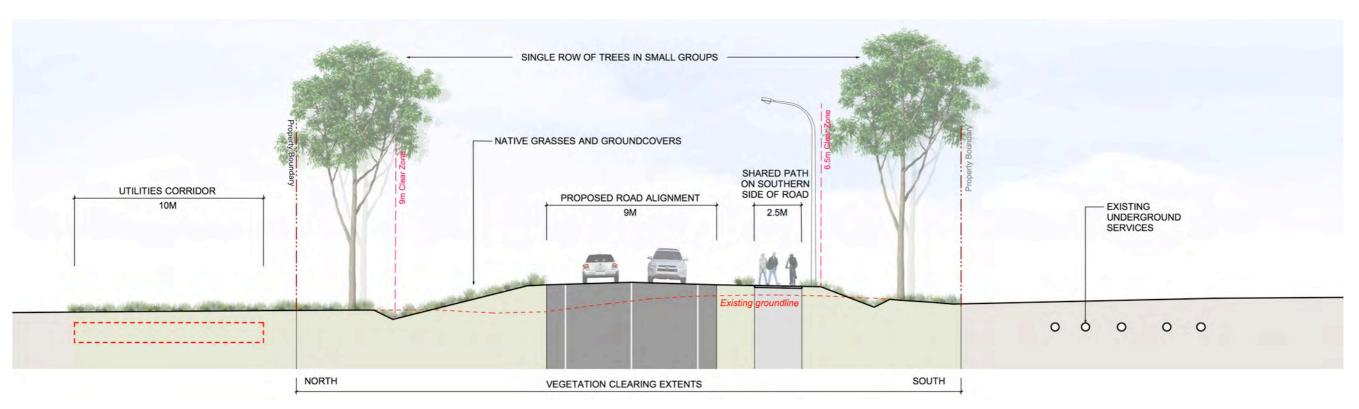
Typical cross section of Parkway treatment in Zone 2, shown at station 6,900
